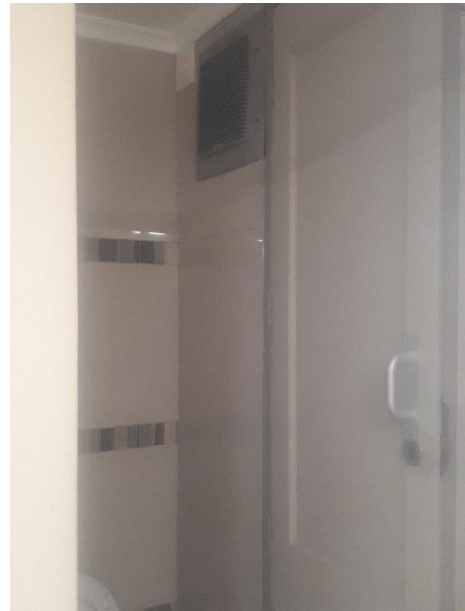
Photo showing typical toilet wall mounted toilet extract fan system. (Extraction lacking in disabled toilets)
